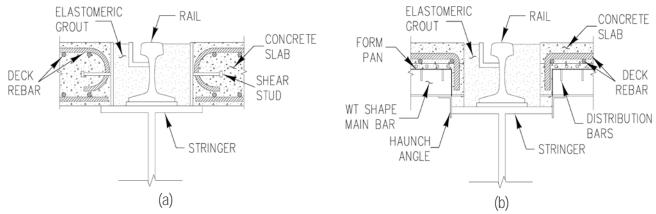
Example of direct fixation rail for a (a) concrete deck and (b) Exodermic deck
